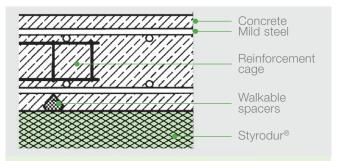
Walkable spacers made of fibre-reinforced concrete for the bottom reinforcement and reinforcement cage of steel mesh fabric for the top reinforcement of the floor slab.
